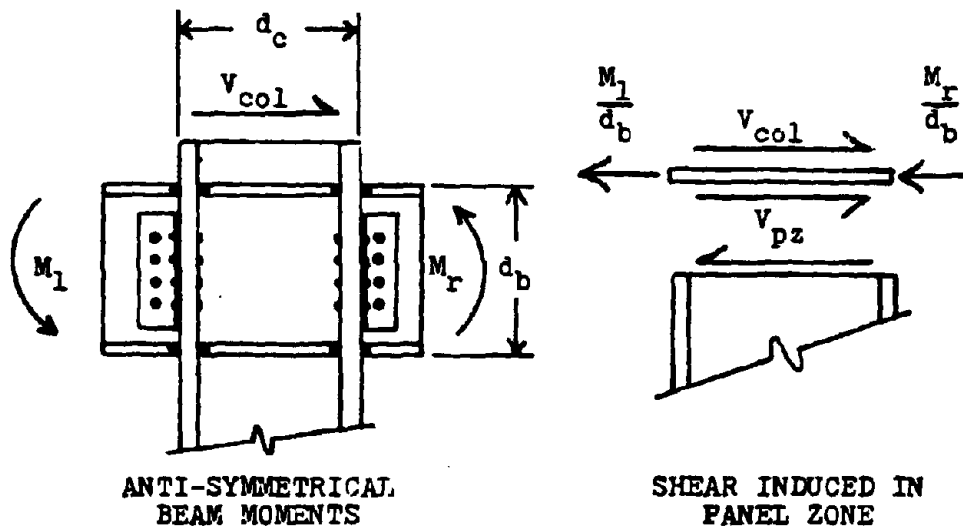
KRAWINKLER FORCE CONVENTION
